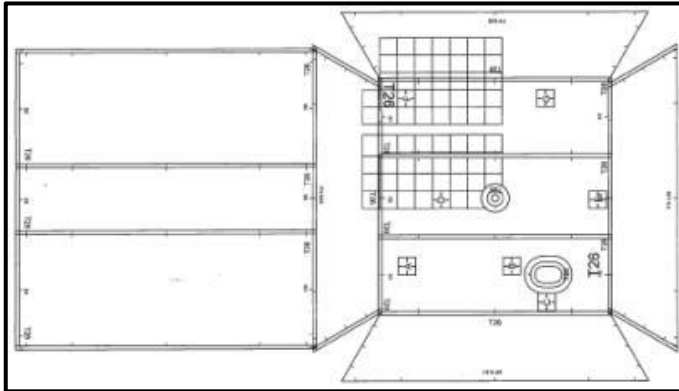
Tank 27 Measurement Panel Layout
